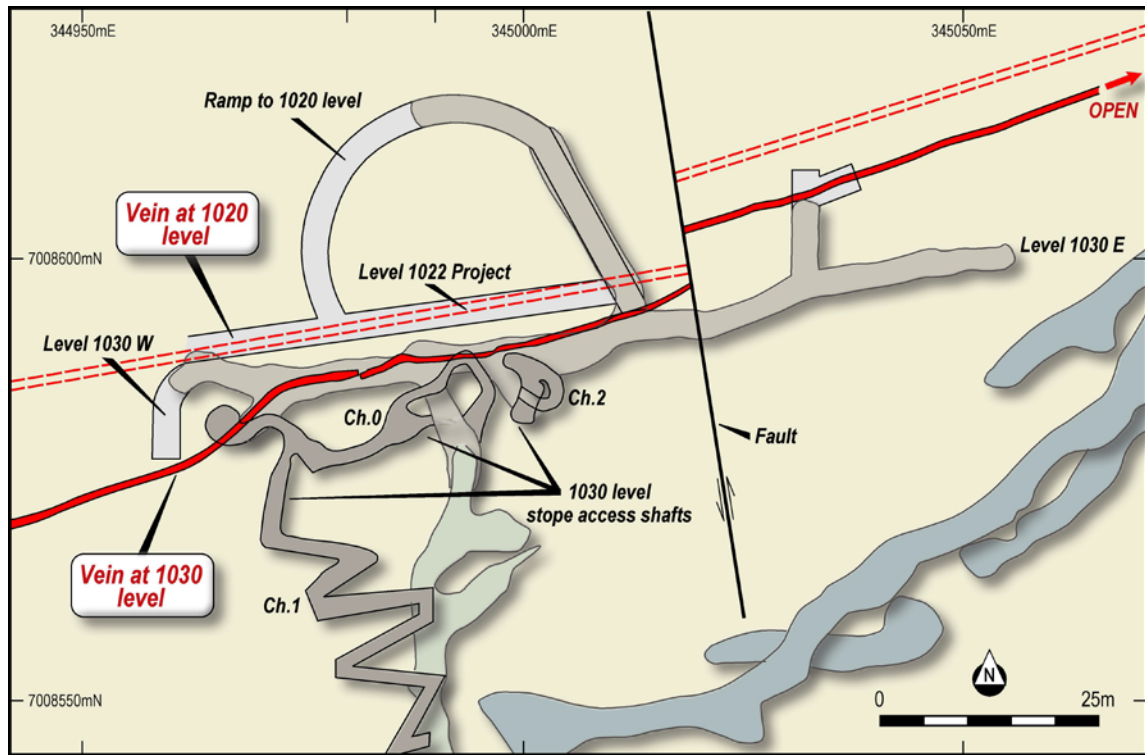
Plan view of the San Sebastian Mine showing location of development tunnels along the 1030 Level and establishment of a ramp to the 1020 Level to access additional stoping panels.
